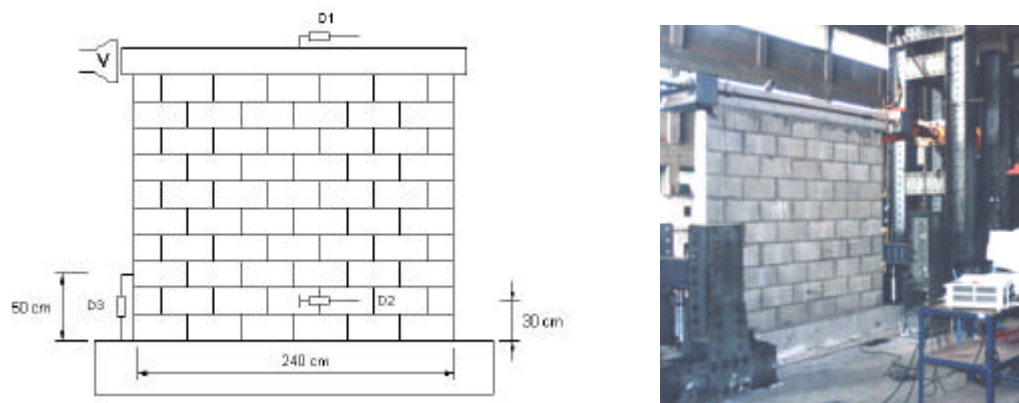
Lateral Load Test for Original Wall W2: Instrumentation and Overall View
